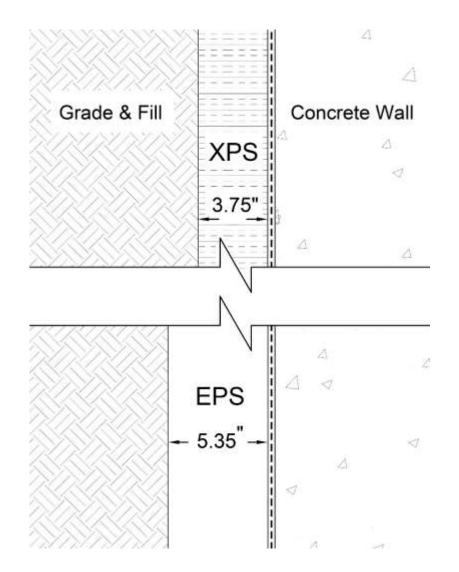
Thickness adjustment for design R-value of exterior R-15 insulation on below-grade foundation wall.
